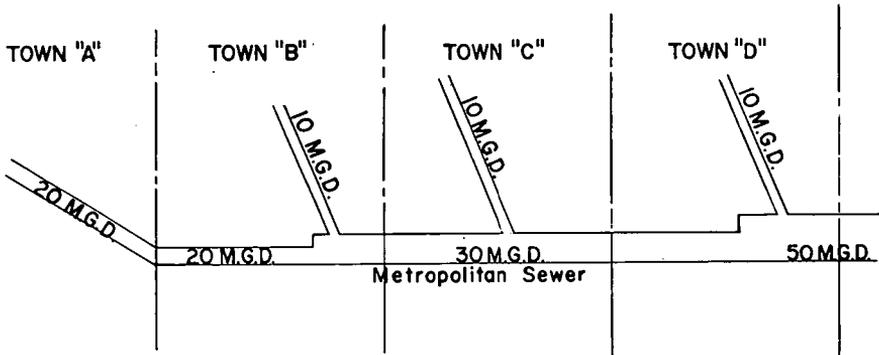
SKETCH SHOWING MUNICIPAL CONNECTIONS TO METROPOLITAN SEWER.
